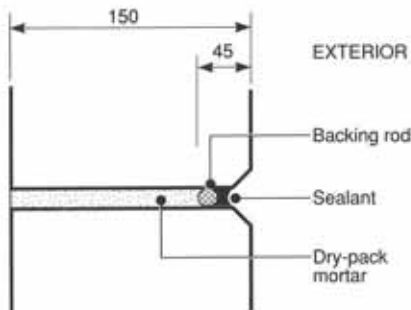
EXTERNAL HORIZONTAL JOINT FOR STAIRWELL WALLS
